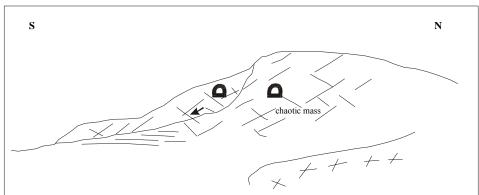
Section Lefkopetra-Veria. Geotechnical problem: landslide in area of portal of tunnel Σ 4 and in the area of associated B4 bridge with chaotic rock mass. Solution: modification of alignment and avoidance of the area of the great landslide. Embankment at the site of the bridge (not scaled).
